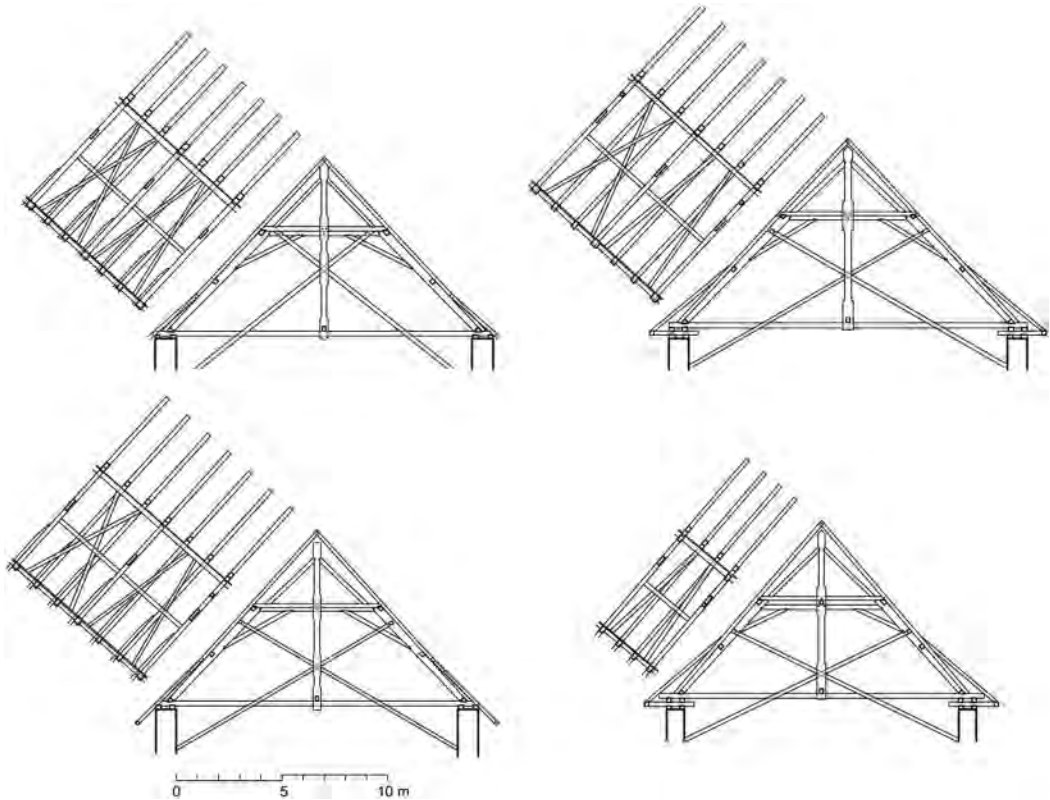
Comparison: roof trusses designed Niklaus Purtschert and built by various sub-contracted carpenters between 1778 and 1802. Cross braces in roofs with continuous tie beams are typical for this particular master builder (M. Gantner, 2019).
